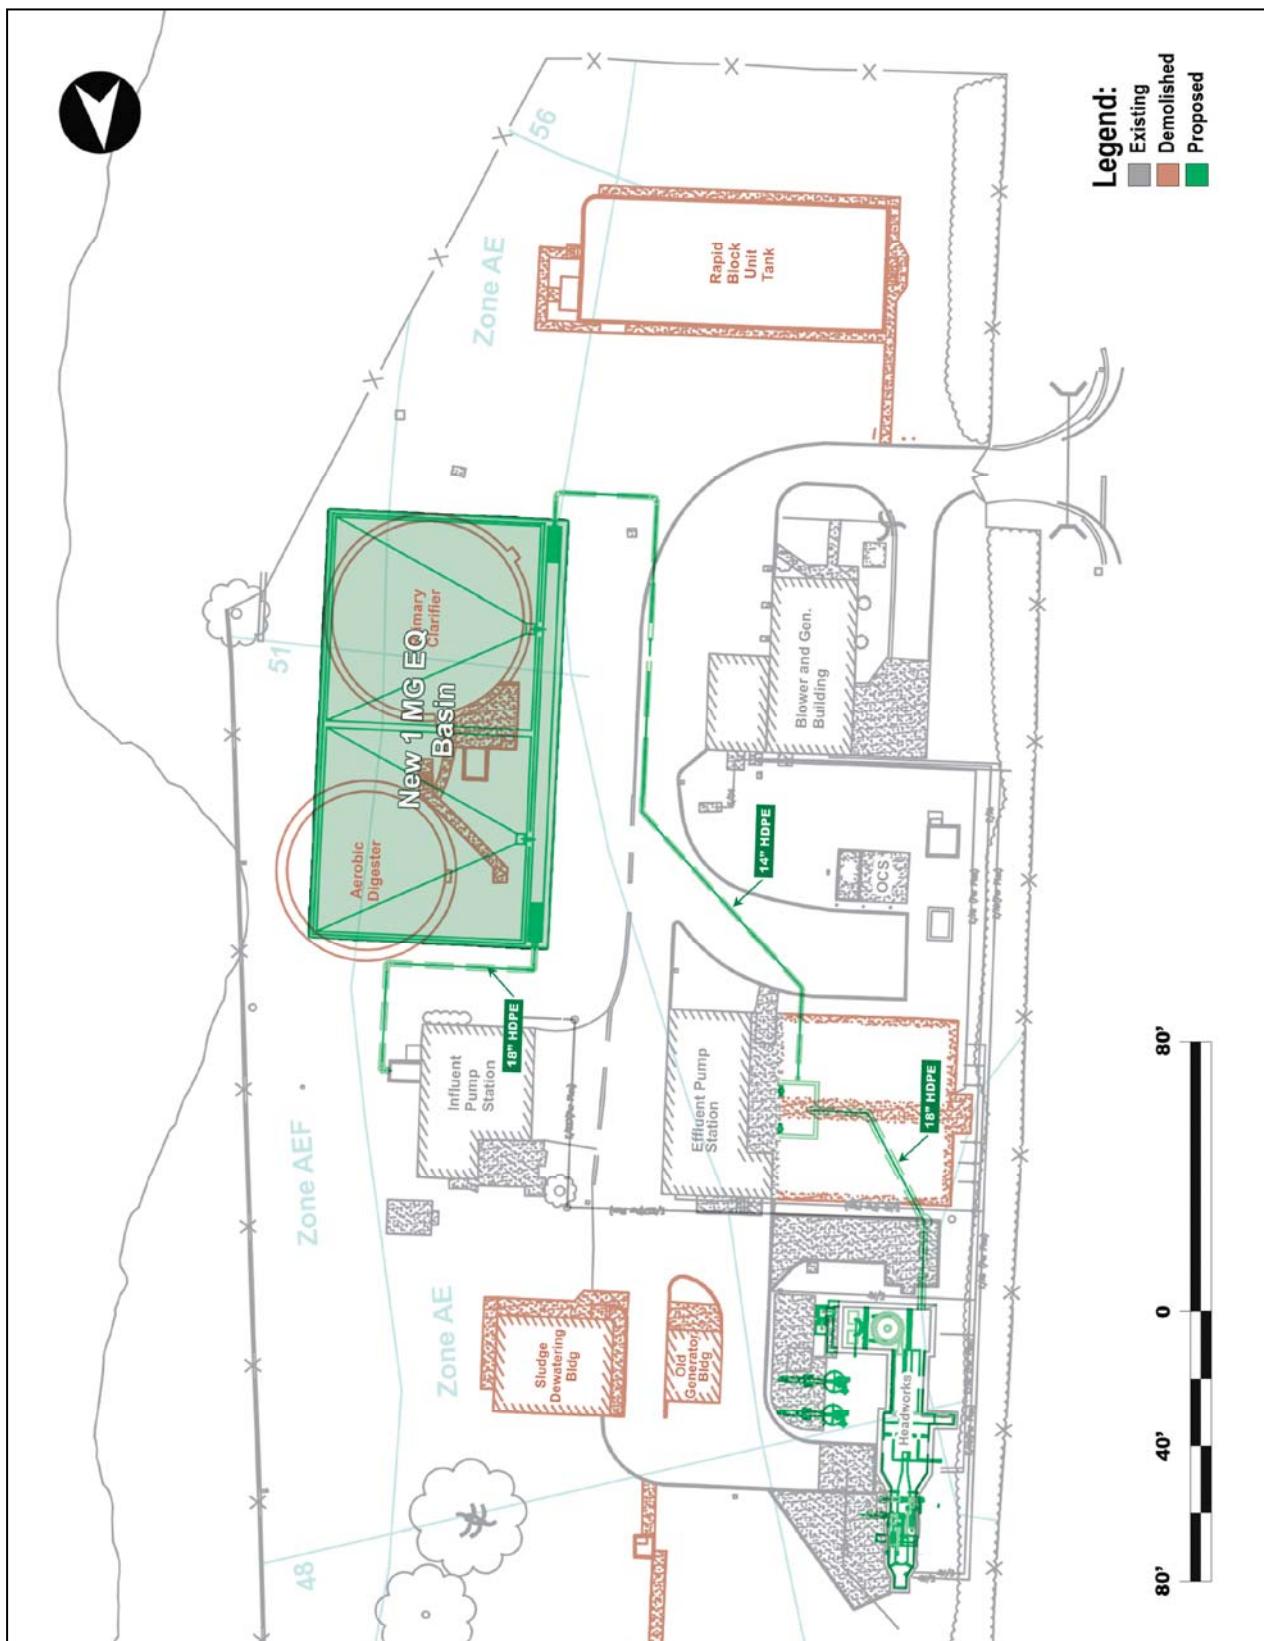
Option 2: 1 MG EQ Basin at Ex. Storage Tank Site
